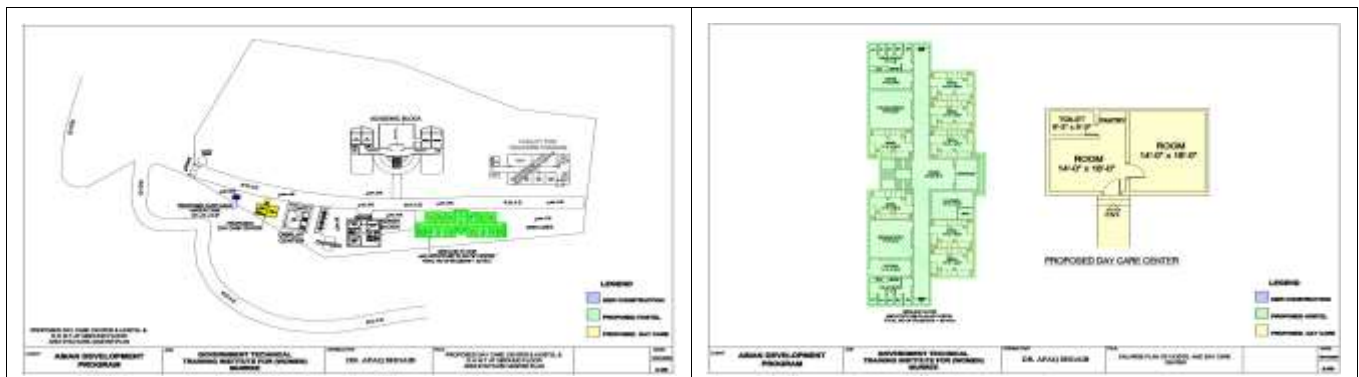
A: Designed Layout plan new facilities (Hostel and Day Care) GTTI, Murree, Rawalpindi
